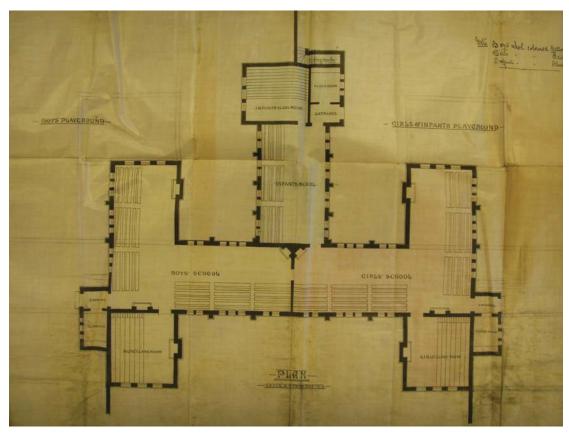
Plan of 1888 showing the building as existing at that date including the basement access at the north-west end (CRO(B) Z1041 1875-1904)
